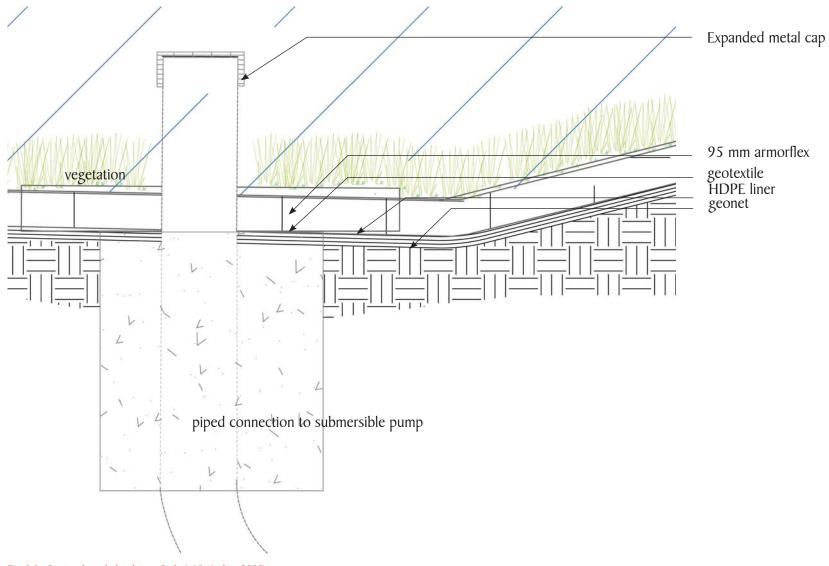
Section through dam linings Scale 1:10 (Author, 2008)
